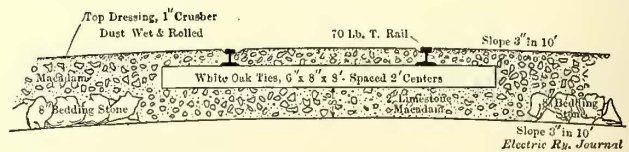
T-Rail Construction in Macadam Streets in Nashville, Tennessee
